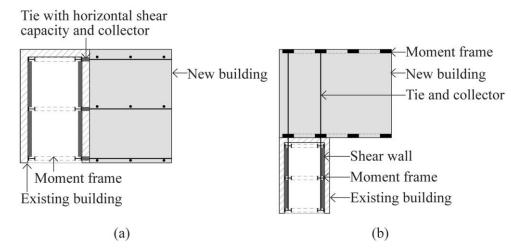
Plans of an existing and new building tied together. In (a) the existing building retrofit structure resists forces in both directions for both buildings, while in (b), retrofitted shear walls in the existing building resist forces for both buildings but each building has its own new moment frames in the other orthogonal direction.
